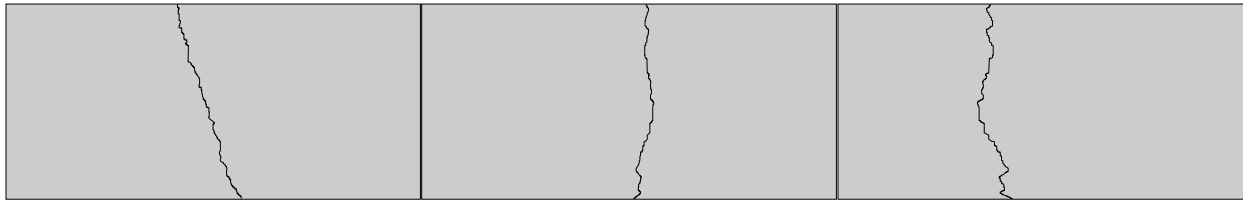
Schematic of typical transverse fatigue cracks in rigid pavements.
